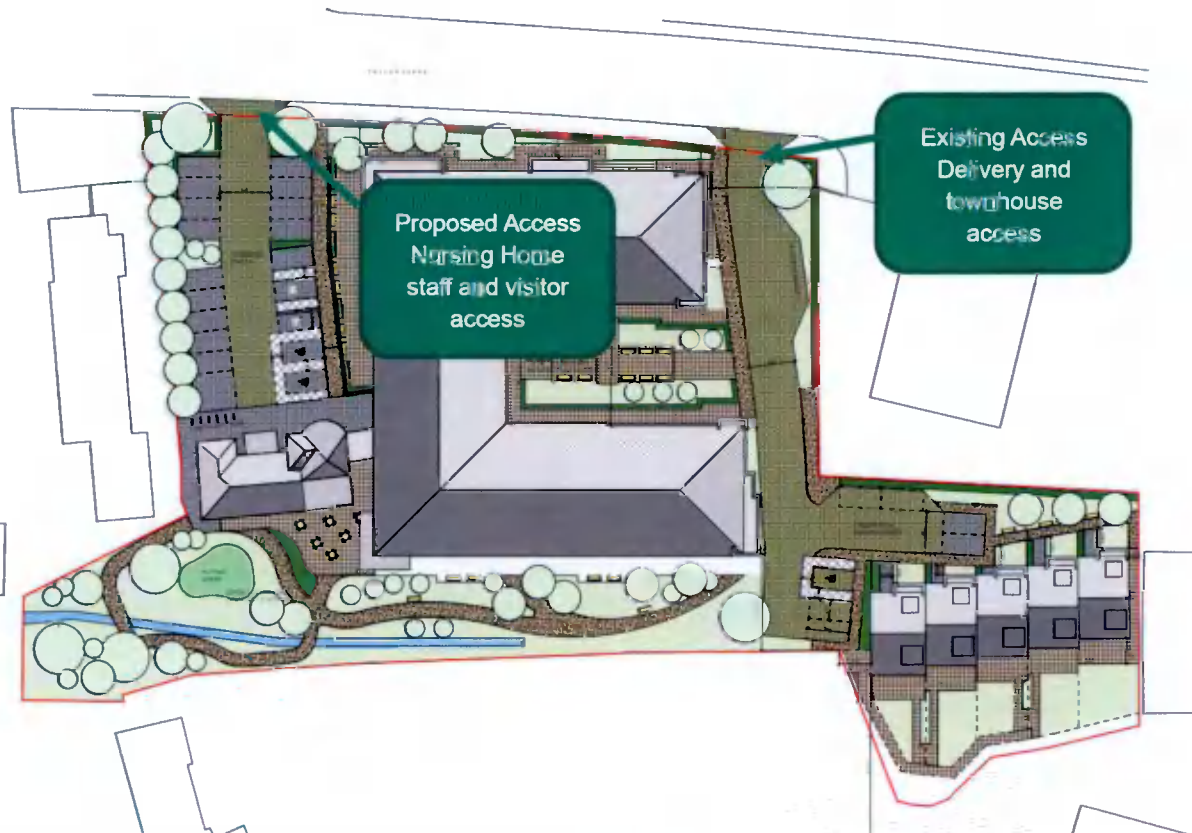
Proposed Site Access Points (Source: Holmes Miller)
